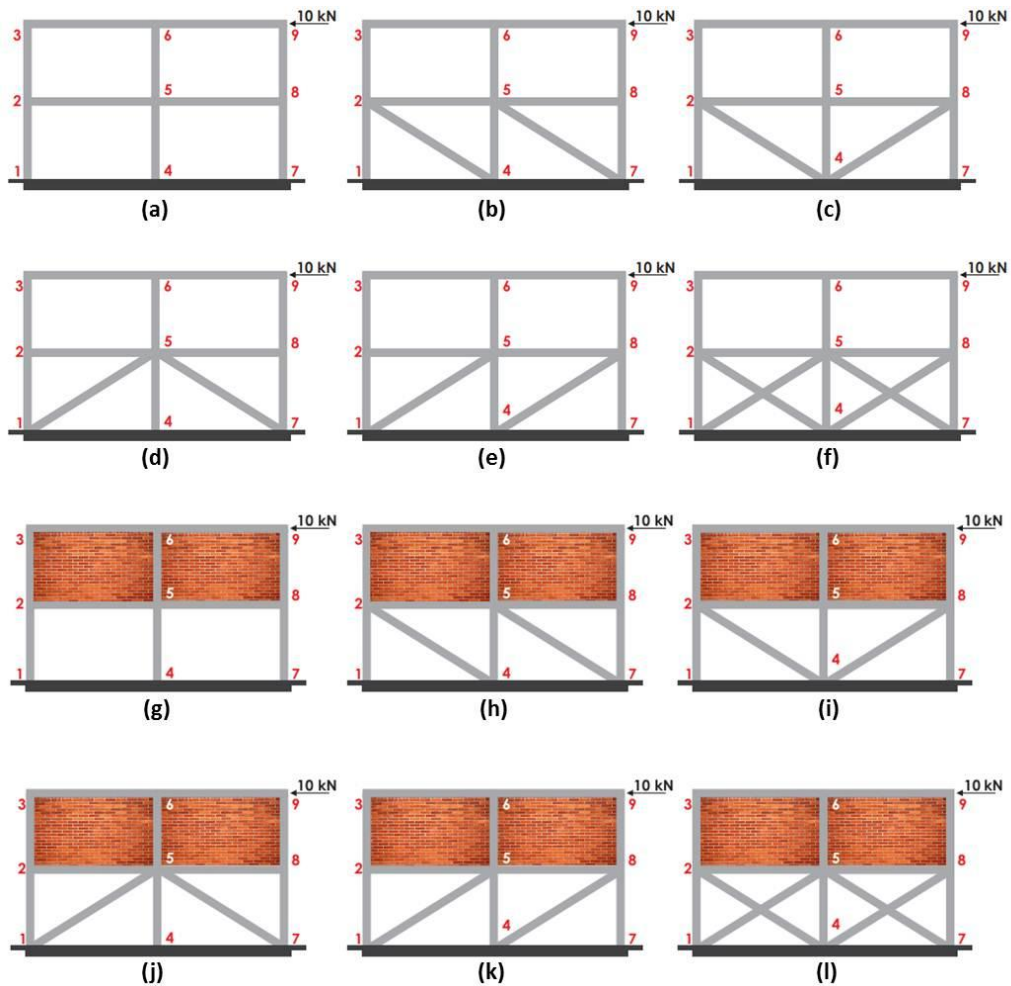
Two bay two storey (a) – (f) without infill walls with possible orientations of bracings (g)-(l) with infill walls.
